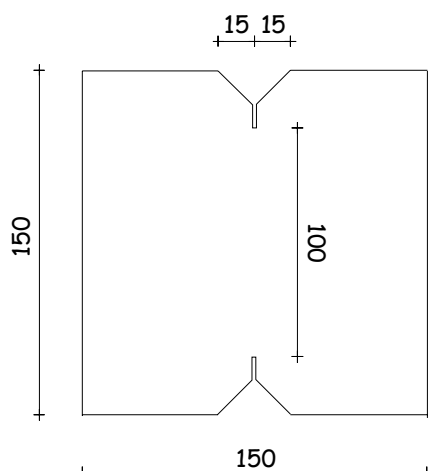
geometry of the specimen for Double Edge Wedge Splitting test (DEWS) – measures in mm.
